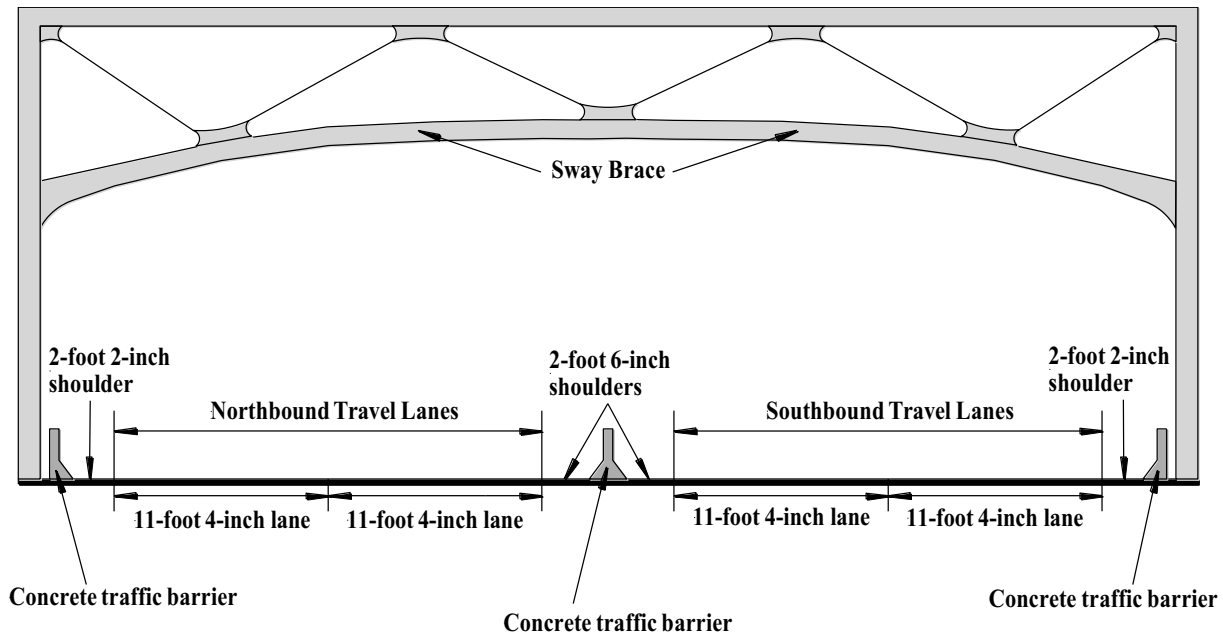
Layout of the I-5 Bridge over the Skagit River
